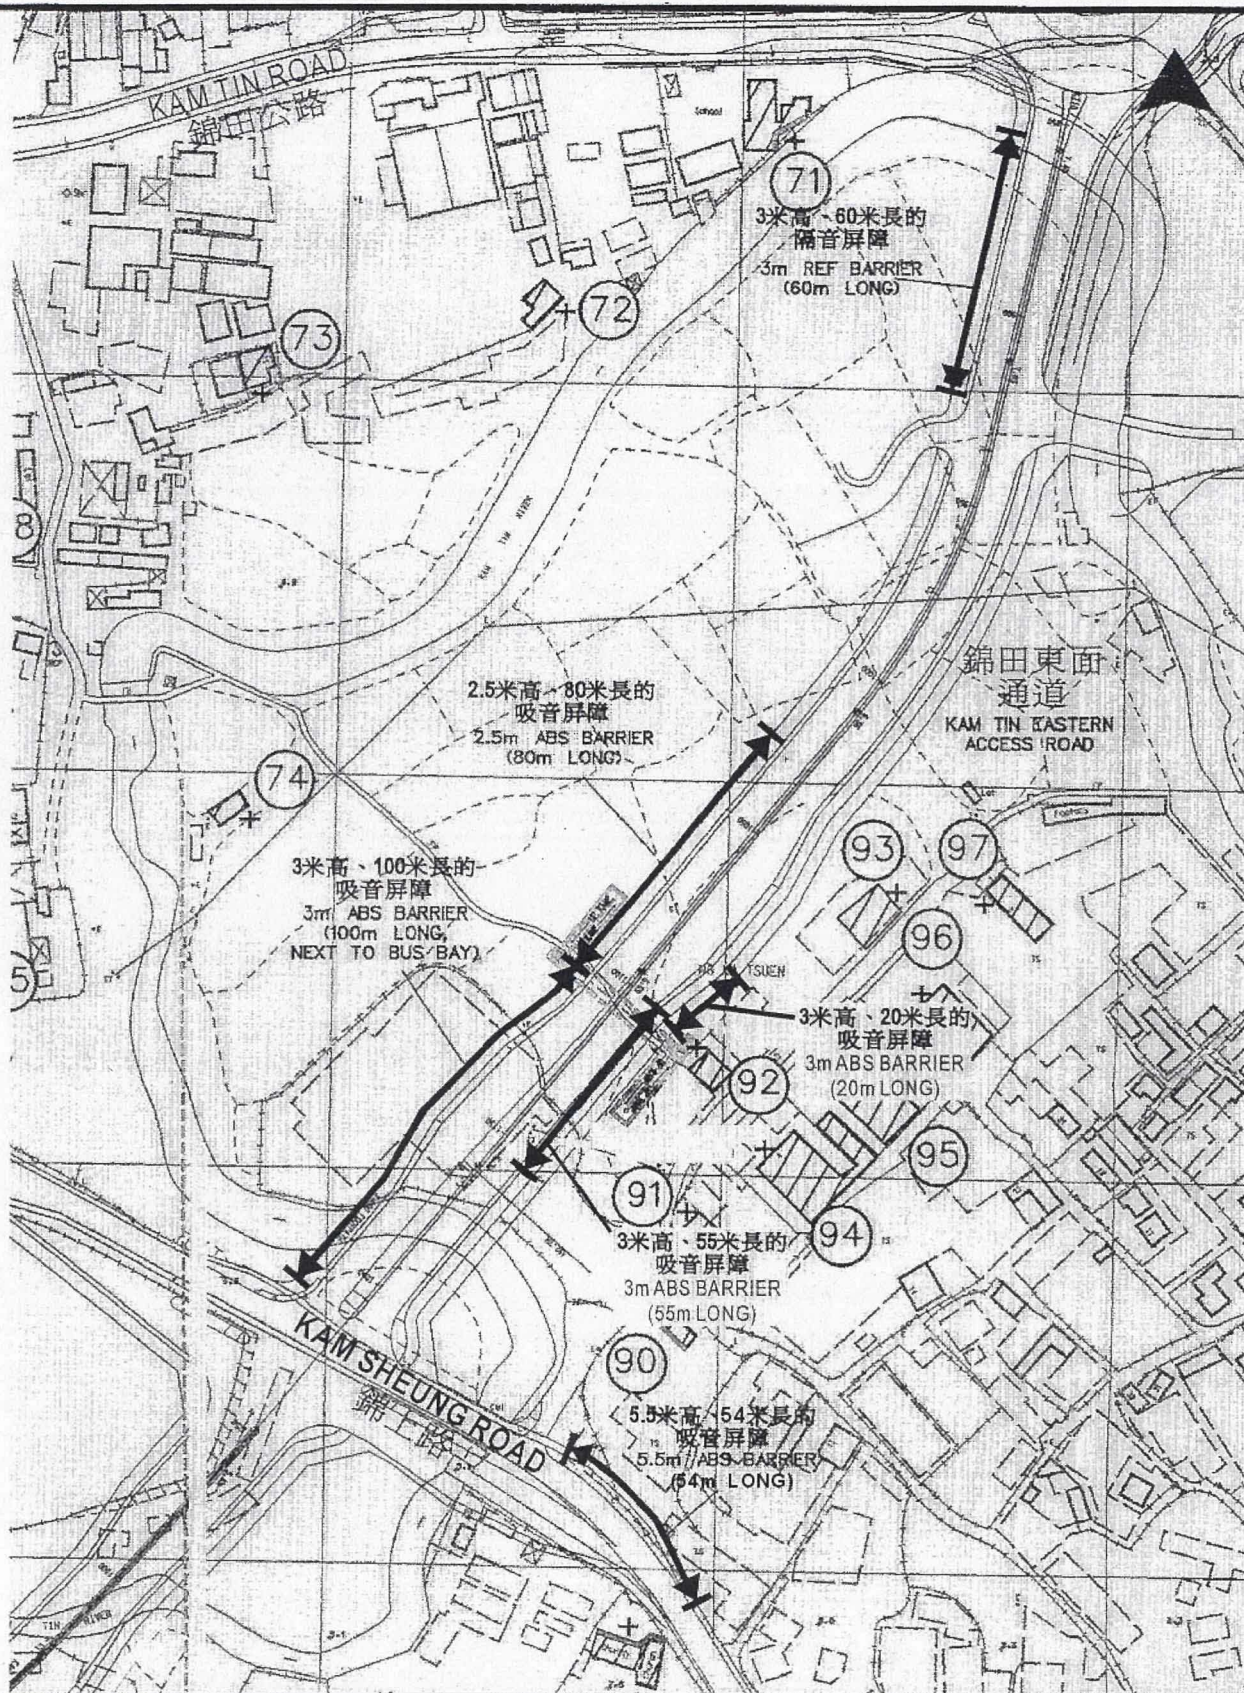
Direct Road Traffic Noise Mitigation Measures For Kam Tin Eastern Access Road (North & East Section)
